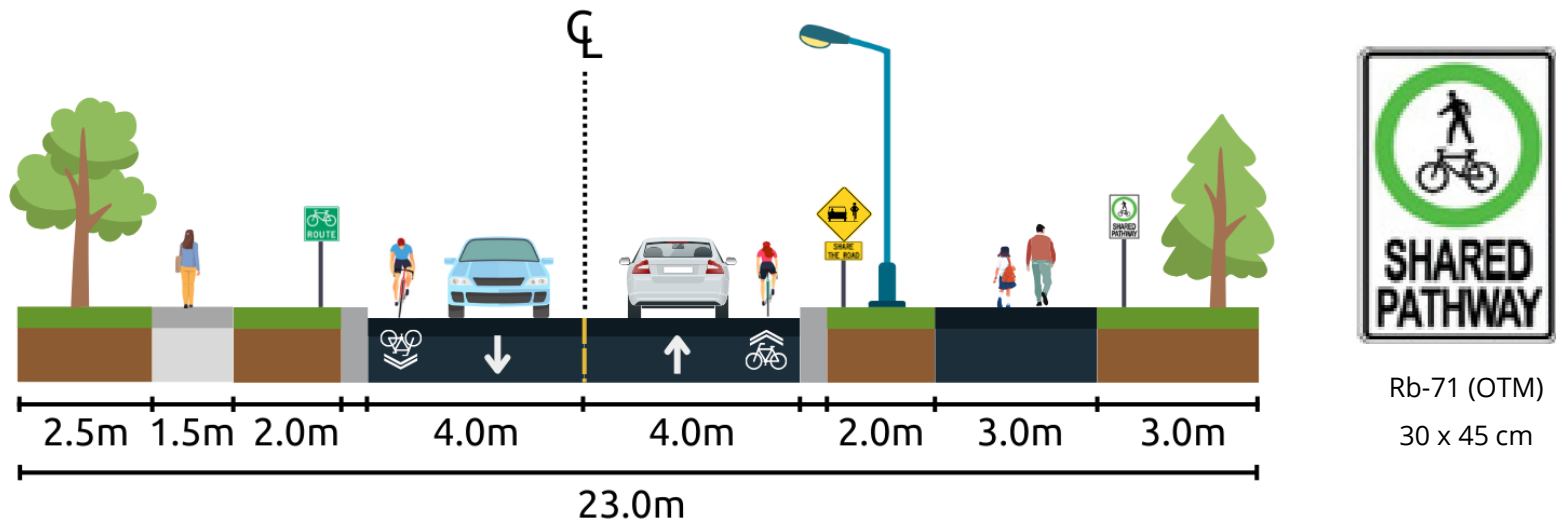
Major Local Road Cross Section Example (with Cycling Enhancements)
